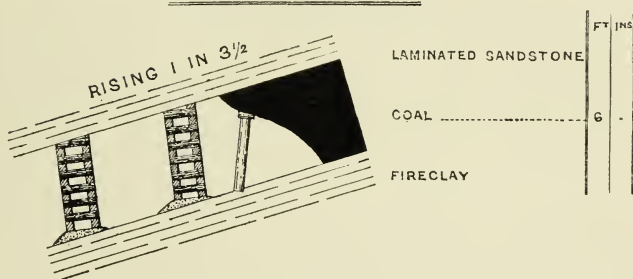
CLIFTON HALL COLLIERY, NEAR MANCHESTER. SECTION OF TRENCHERBONE COAL SEAM.
